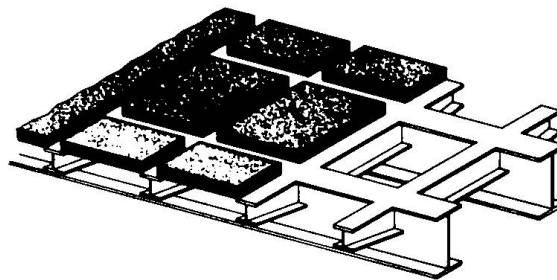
Precast slab elements on a steel structure with floor-beams
